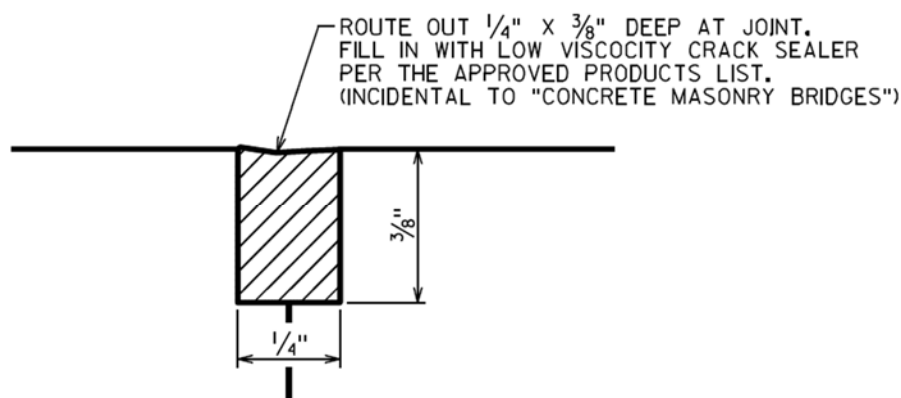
WisDOT longitudinal construction joint standard detail (WisDOT 2017)
